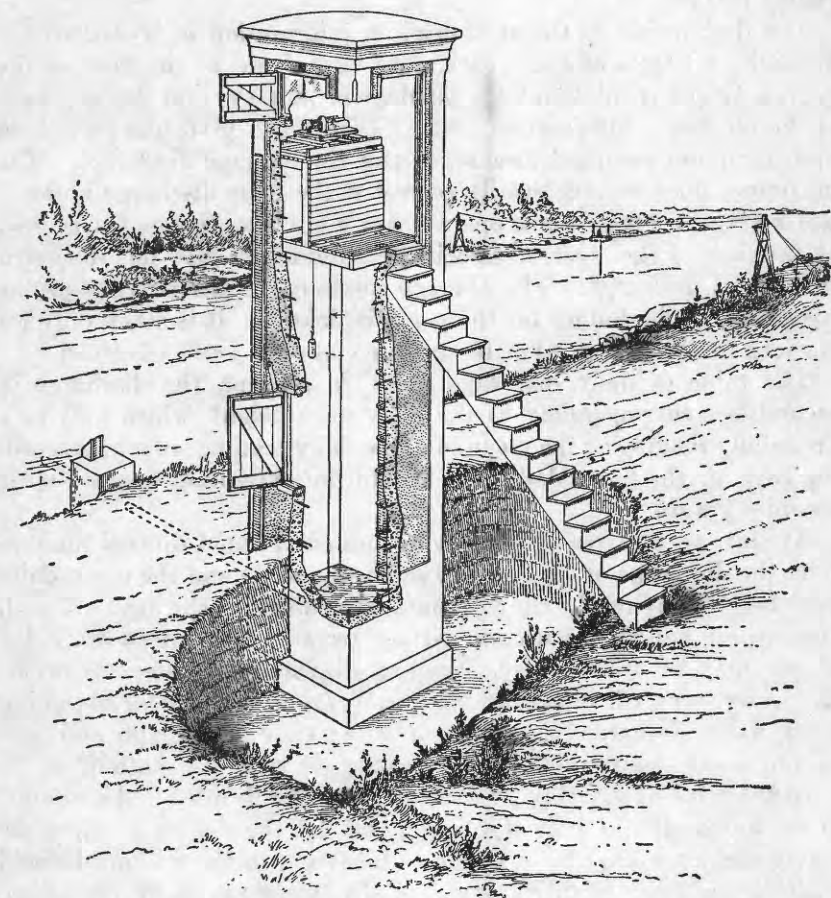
Typical river-measurement station showing concrete well and house for water-stage recorder and staff gages, cable, and car.
